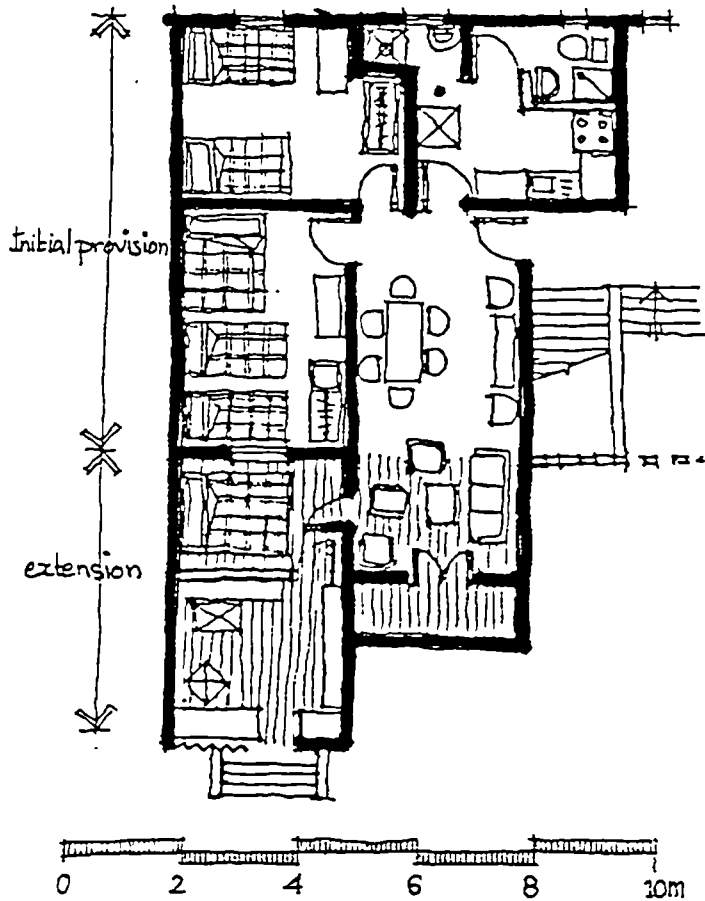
The plan of Abul Rahman's housing unit. The extension consists of one room and a large unroofed terrace where an additional room will be constructed in the future. The structure of the extension is of load bearing brick work.
